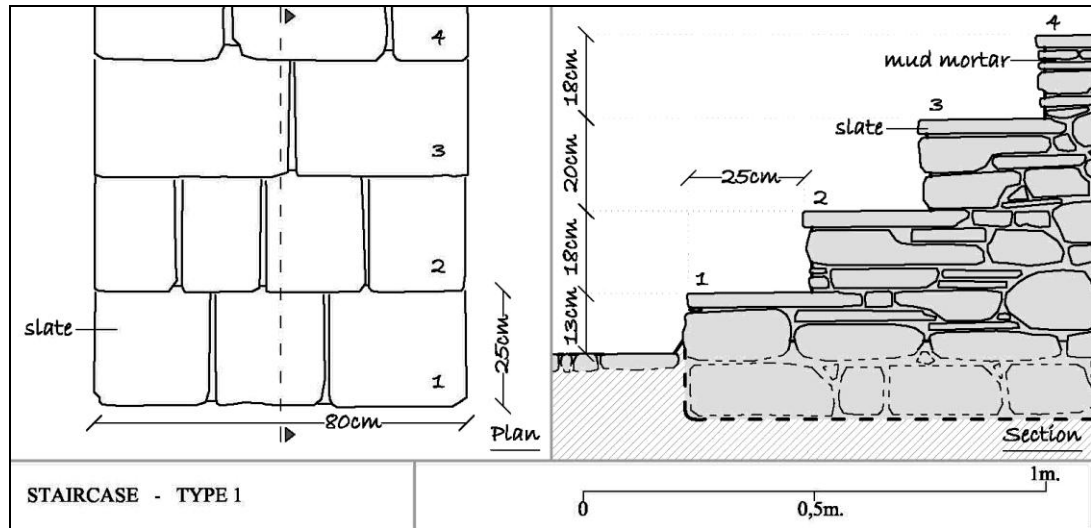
, Staircases Type 1 (Camikebir Quarter Gül Street No:15)
